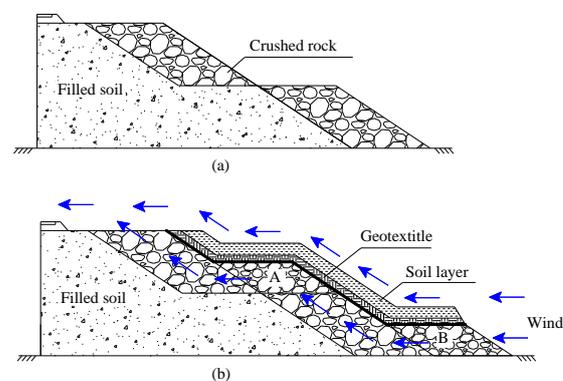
Structural diagram of the embankment slope transformation. (a) The existing CRR; (b) the new structure. Notes: Arrows stands for air flow direction.
